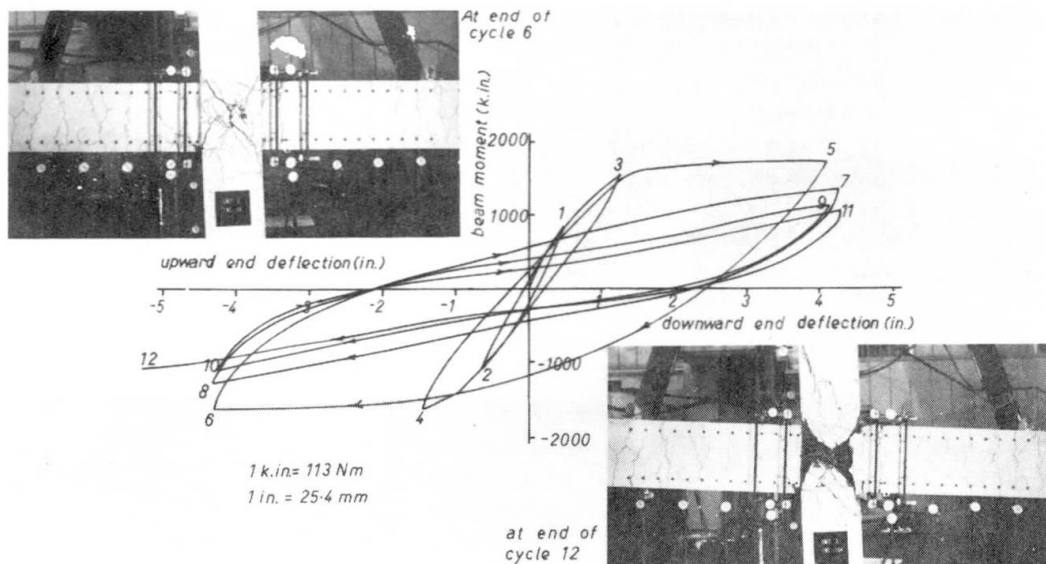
Unit 3 Beam Moment at Column Face versus Beam End Deflection
